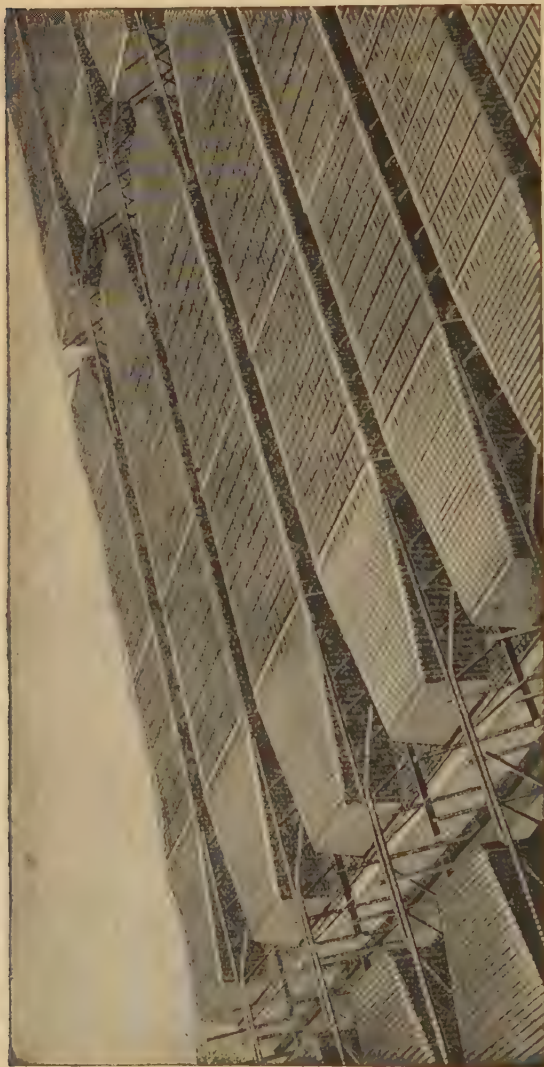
,065.—Trucson cantilever floor construction. The cantilever designs are notably strong and rigid, and exceptionally economical of materials. The use of cantilevers in reinforced solid concrete construction necessitates arched ceilings, which often present decided disadvantages. Cantilever Floretype construction provides flat ceilings of long span, every point in the span assuring maximum economy.
